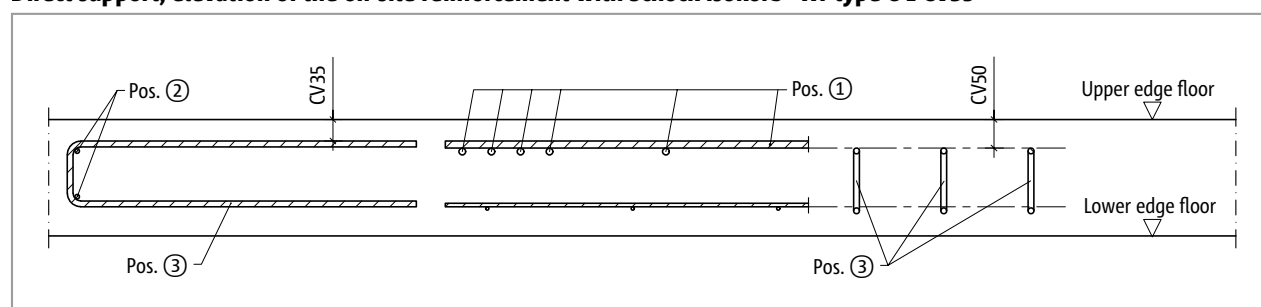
Schöck Isokorb® XT type C: On-site reinforcement outer corner (section XT type C-L-CV35, view XT type C-R-CV50)
